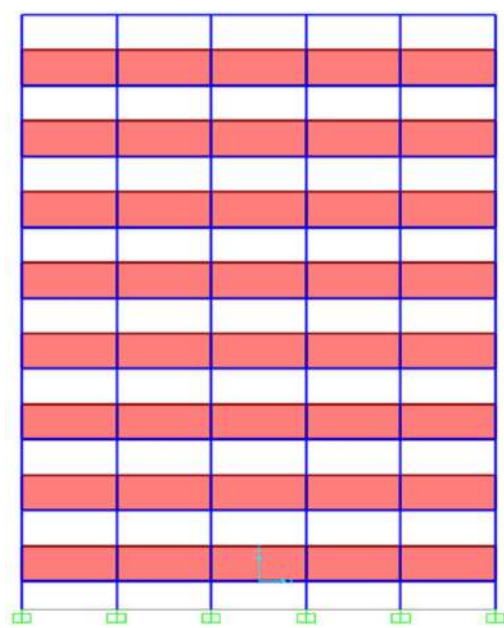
Elevation of 50% Partially in-filled frame with composite column
